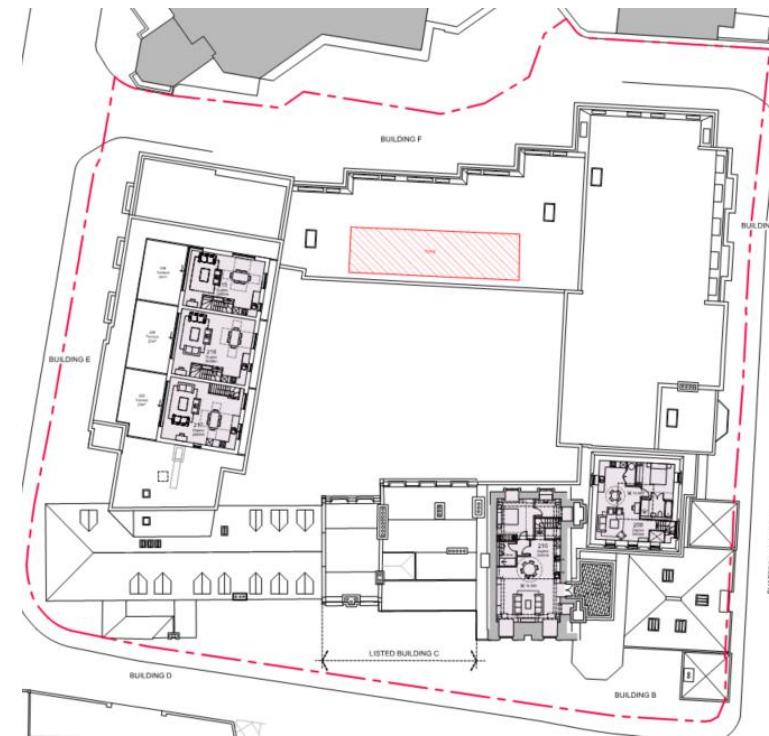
Third floor plan demonstrating potential roof area for PV on building F.
